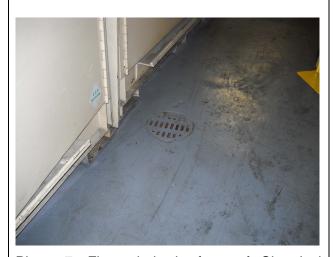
Floor drain in front of Chemical Storage cabinets A and B. No staining or leaking was observed.
